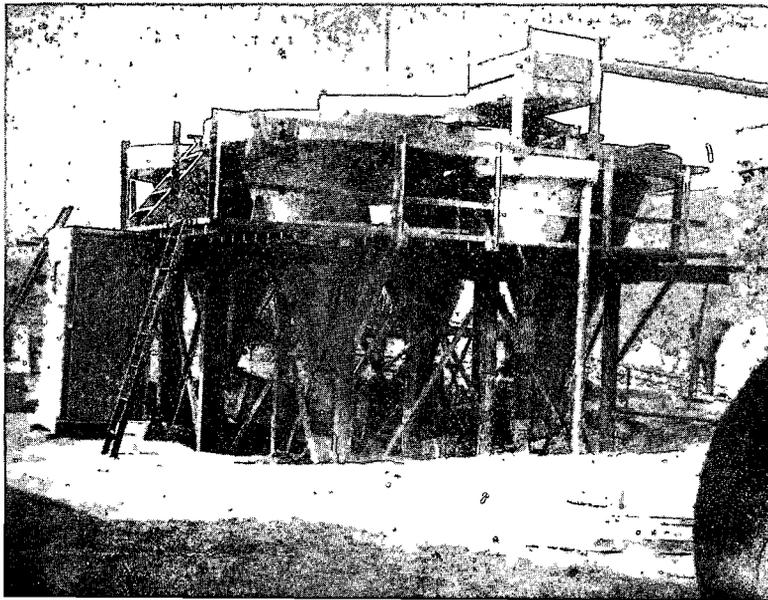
Sand Filling Plant. Elevation showing General Arrangement.
